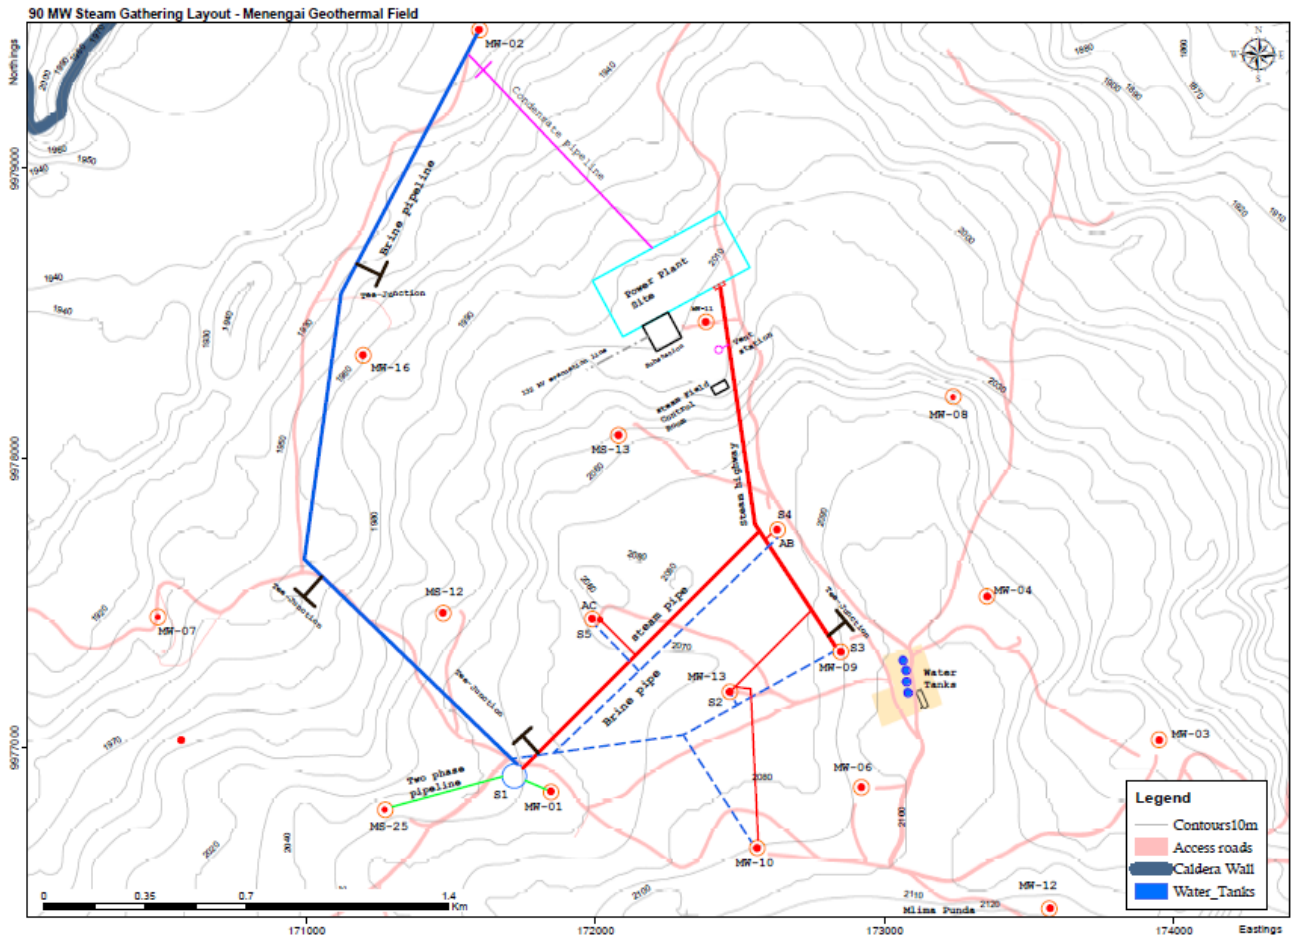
The layout and network of steam gathering system in the proposed project area
